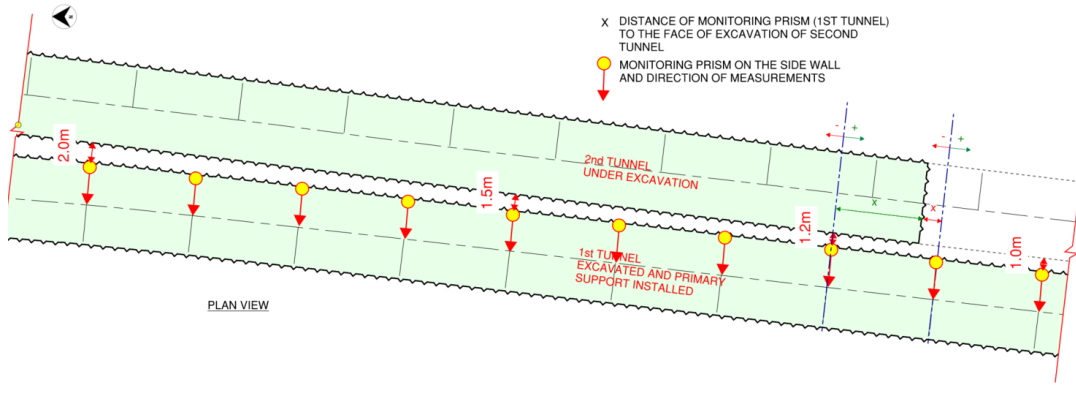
Location of additional monitoring targets on the 1st tunnel sidewall
